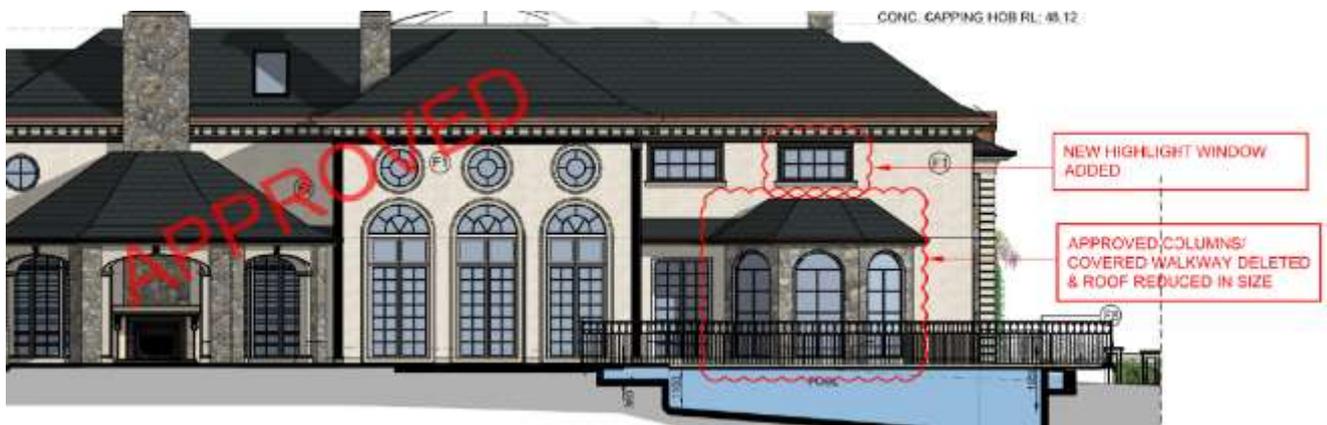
An extract of the modified rear elevations, highlighting the proposed new window outside bedroom 2 and the reduction of the roof feature.
